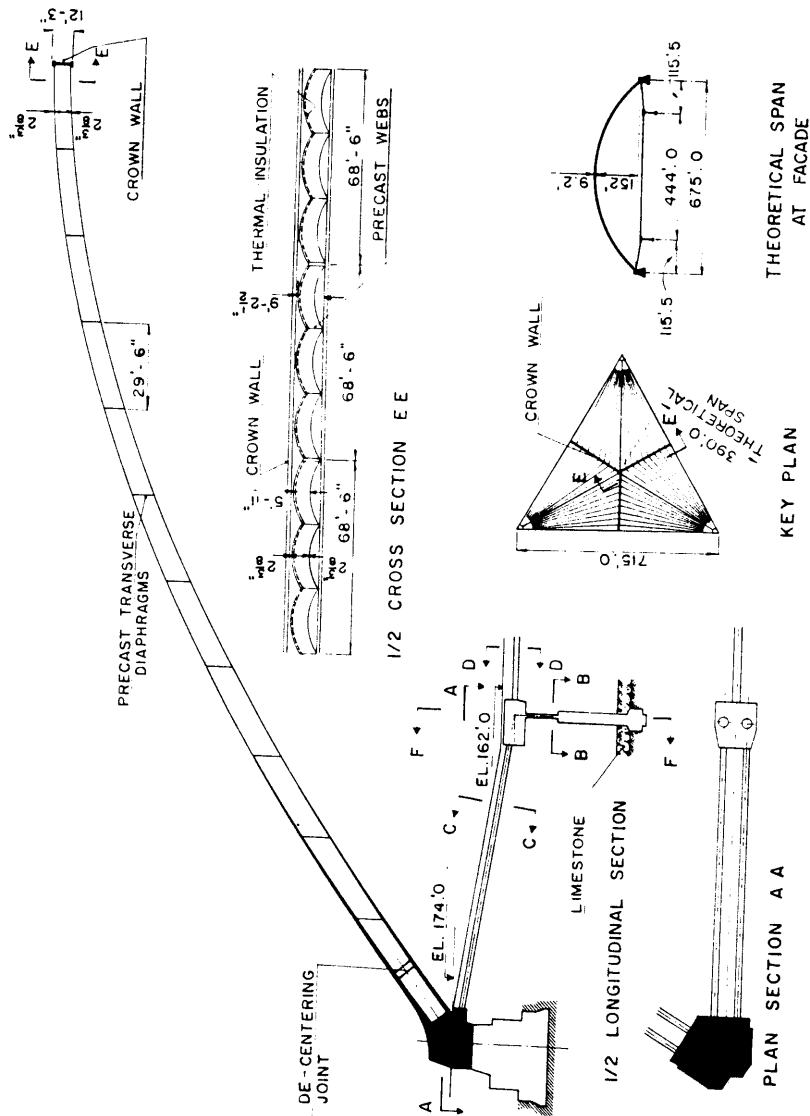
GENERAL LAYOUT OF ROOF AND ANCHORAGE FOR ABUTMENTS.
